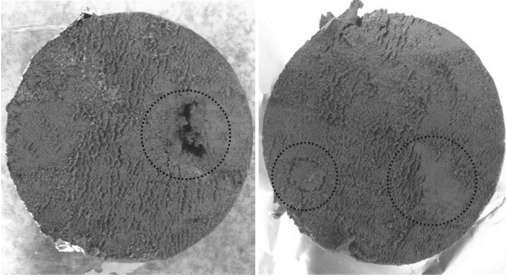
Cross section of soil specimen from 7.5 m, Halsen.
